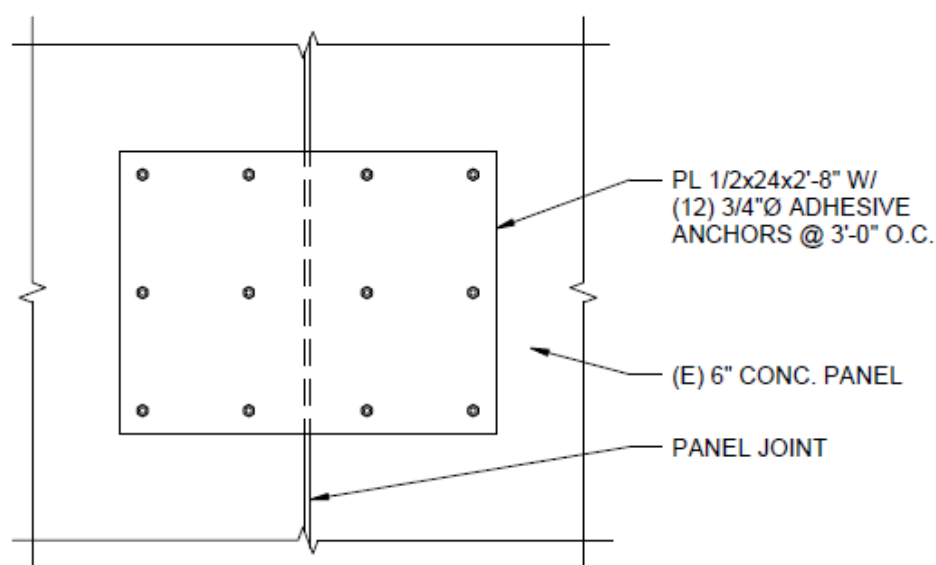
Precast Panel-Panel Connection Strengthening (Exterior Face)
